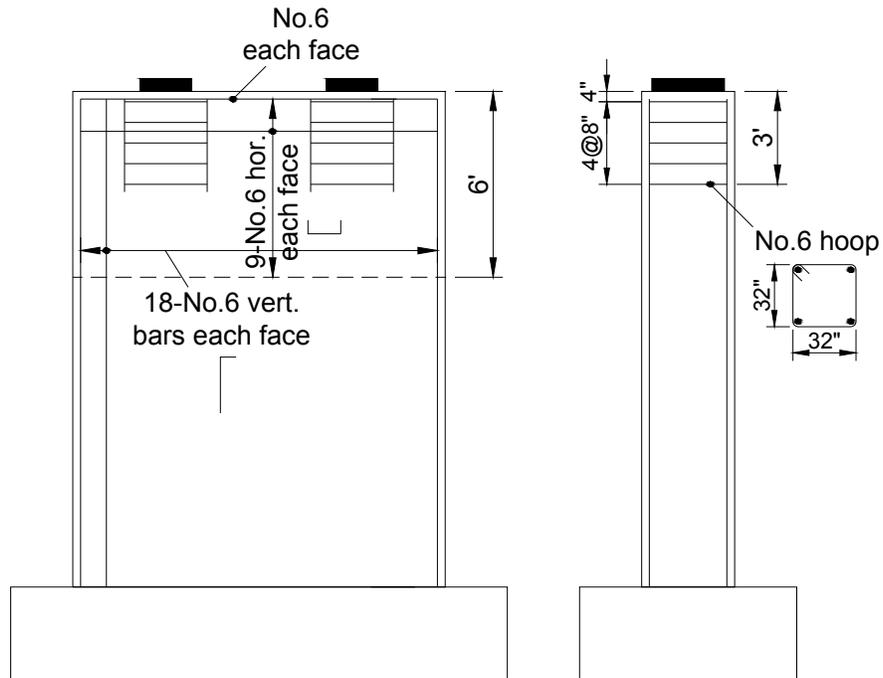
Reinforcement details of wall (reinforcement outside of D-region and footing reinforcement not shown).
